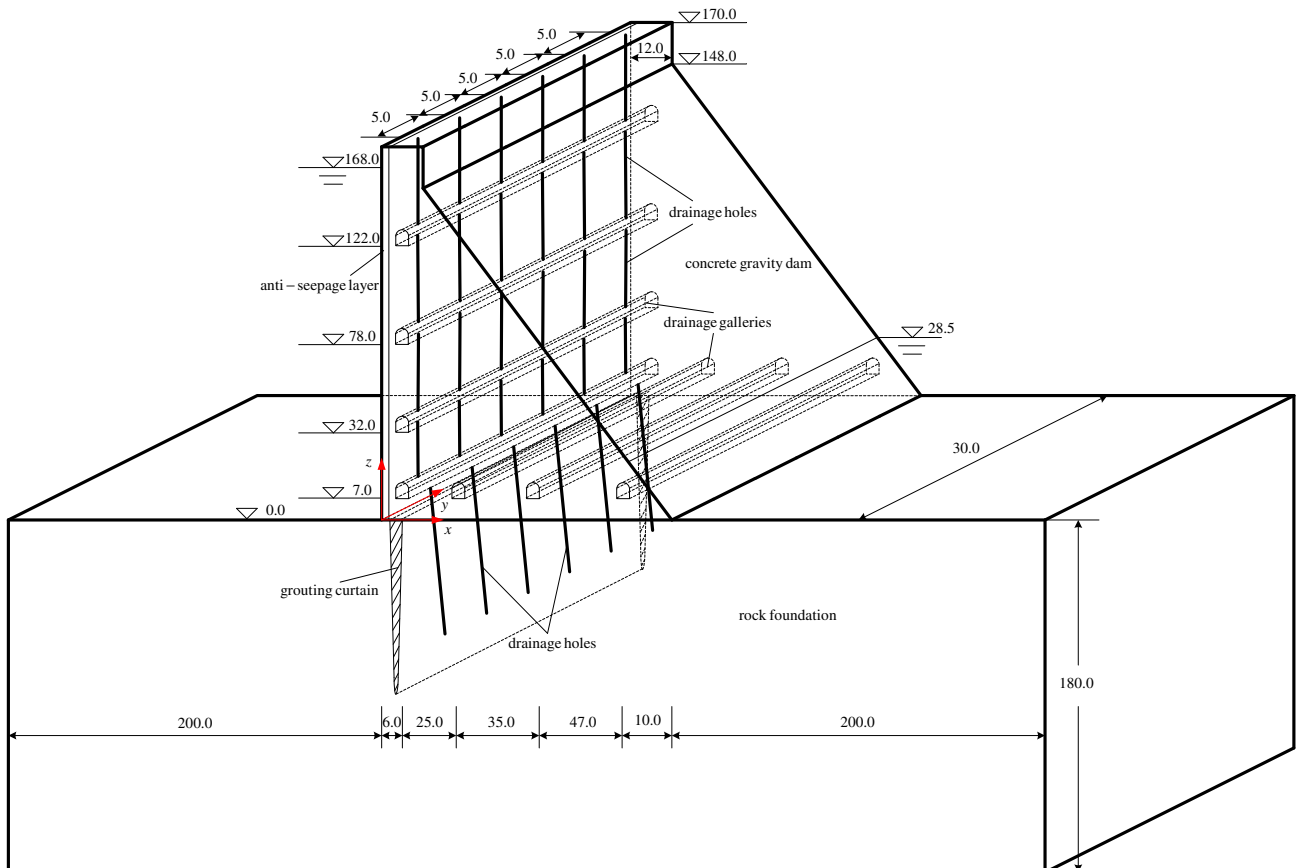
Illustration of a concrete gravity dam section with drainage hole array and drainage galleries.
